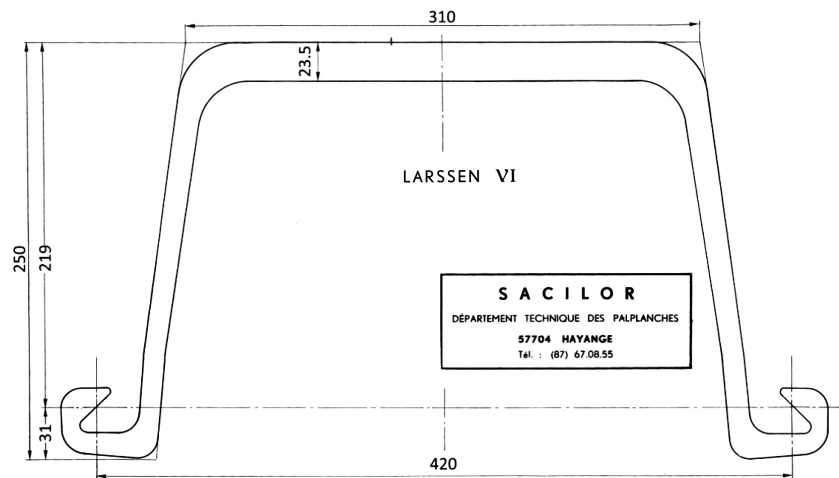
Larssen VI sheet pile shape (W=4200 cm³.m.sh.p.w.)
